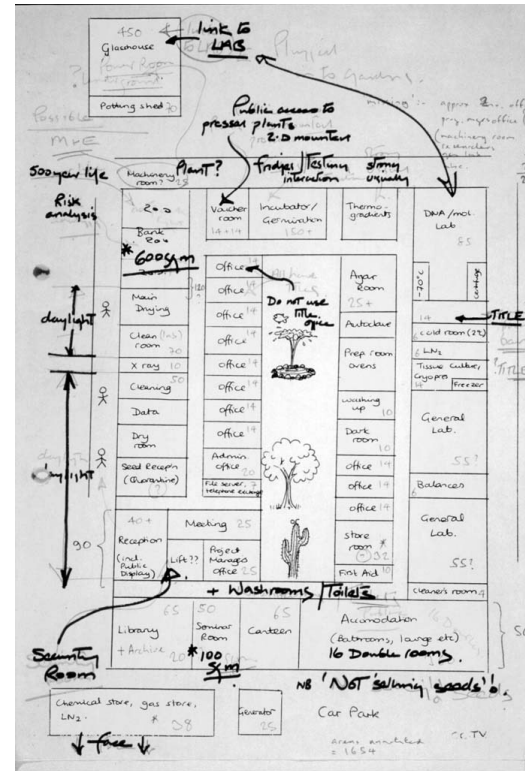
Plan layout development (Stanton Williams Architects: online).
